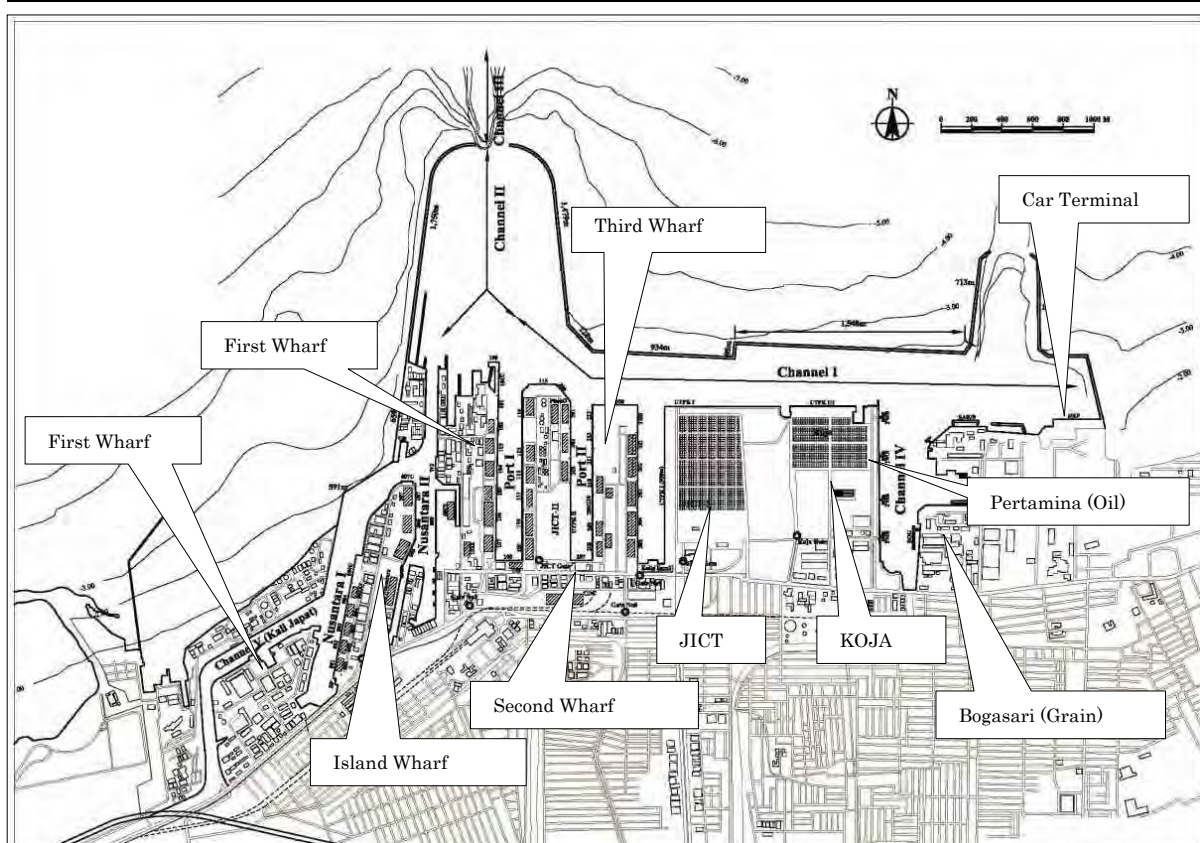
The Existing Facility Layout of Tanjung Priok Terminal
